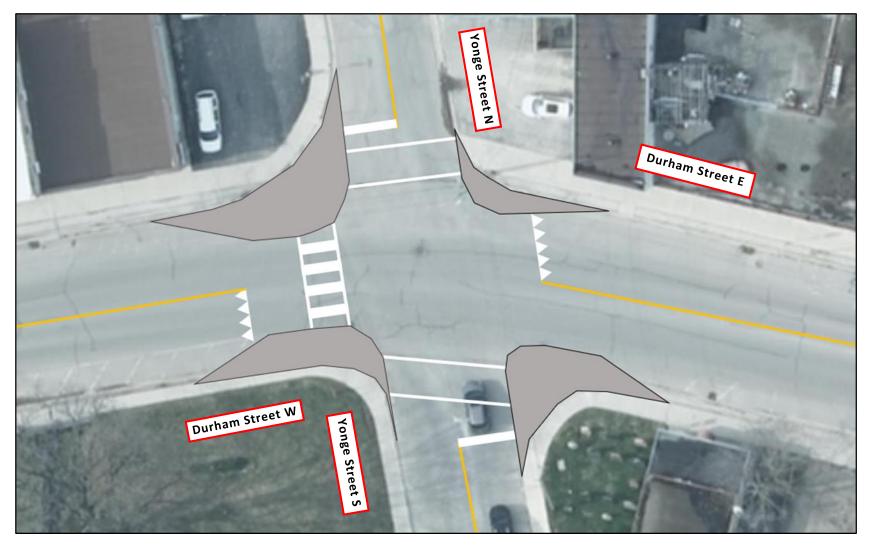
Potential intersection layout with curb extensions and west crosswalk PXO.
